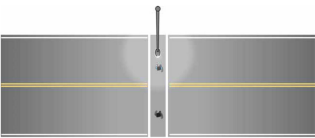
Drawing. Traditional midblock crosswalk lighting layout.
